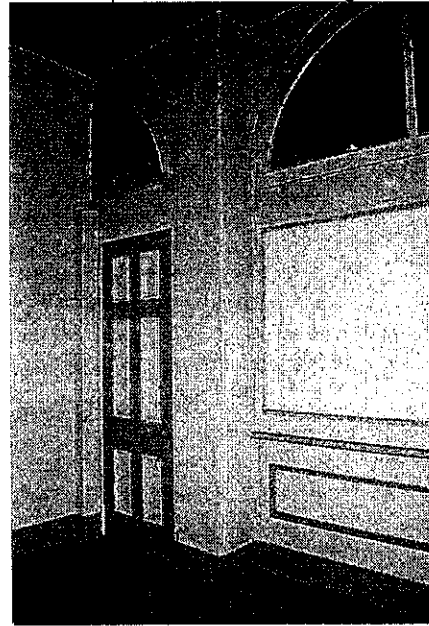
Interior, Ladies' Toilets (space B08a). View looking south-east showing introduced panelled timber and glazed arcade partition and appropriate six panelled timber door.
